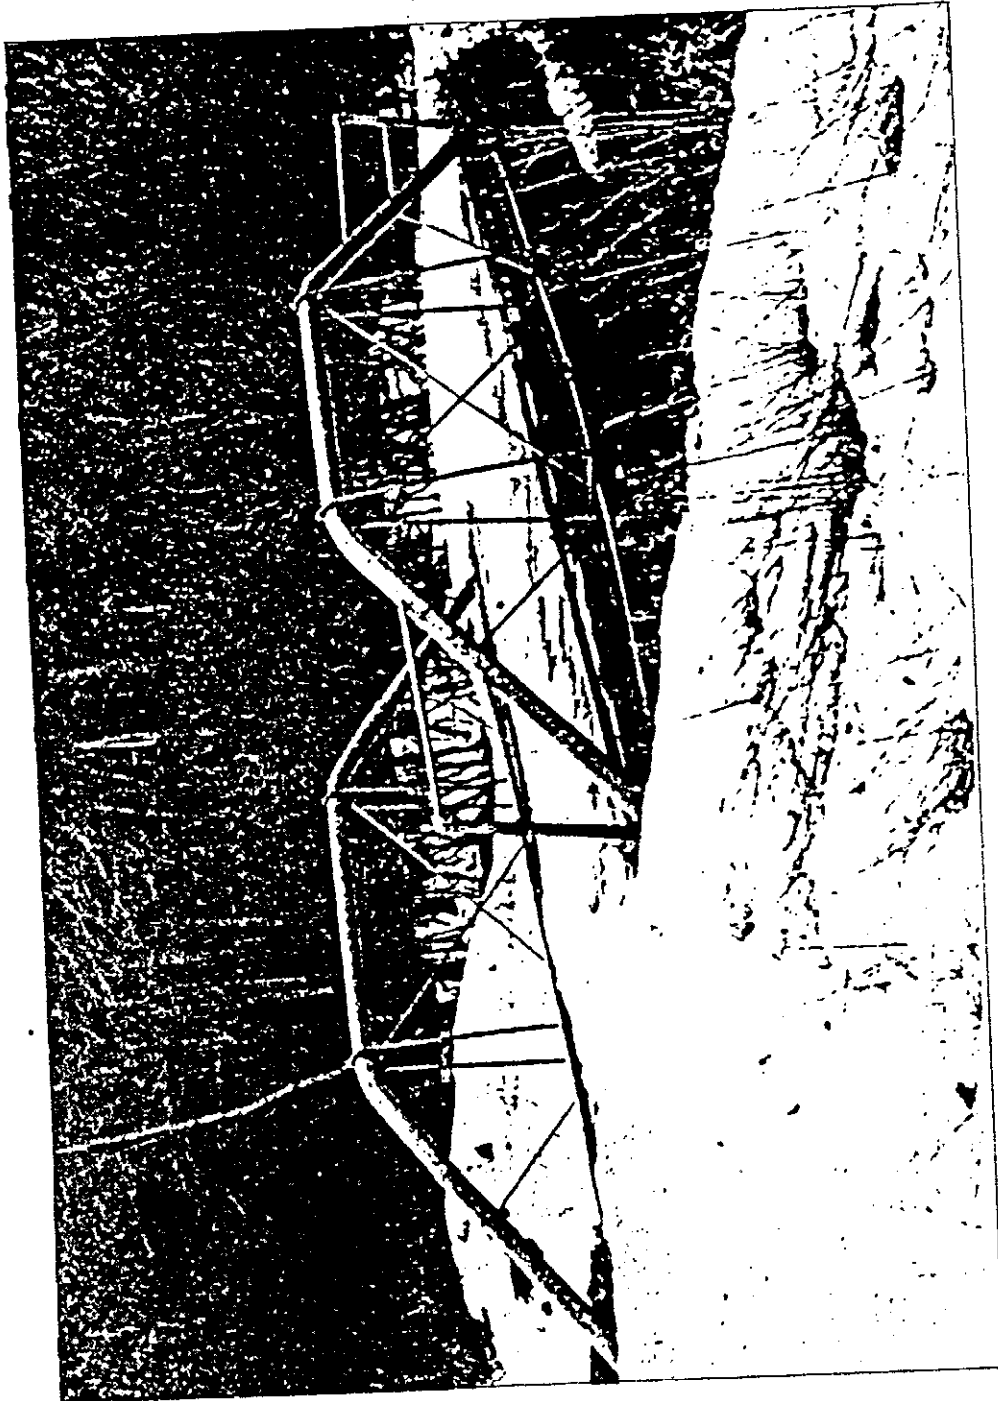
Photo of Coleman Bridge on Windsor Bush Road.
